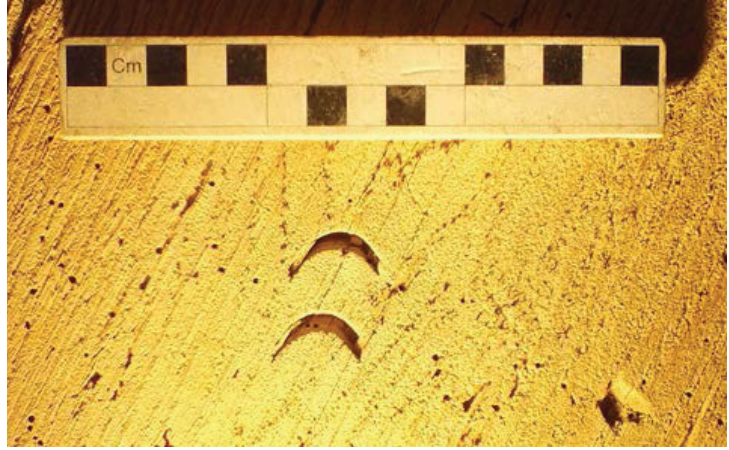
(right): Carpenter's mark 'CC' on the east side of the north face of Truss 2, Room 2
